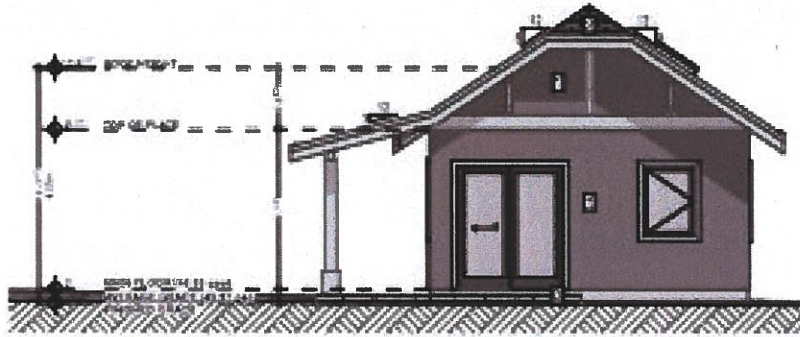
Proposed Right (west) Elevation (from plans by Adapt Design)
